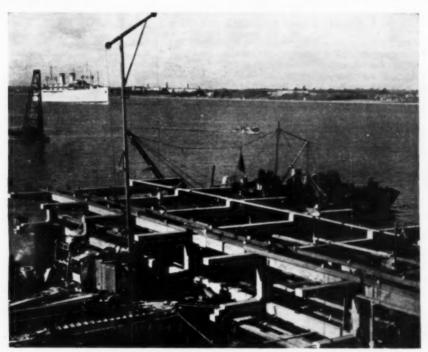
Part of Pierhead Trestle: Floating Mixer on left.
